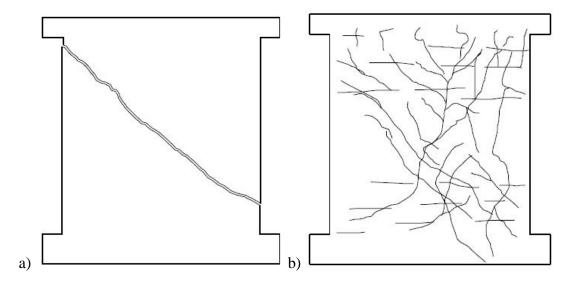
(a) Brittle-shear failure and (b) ductile shear failure of wall panel [7]
